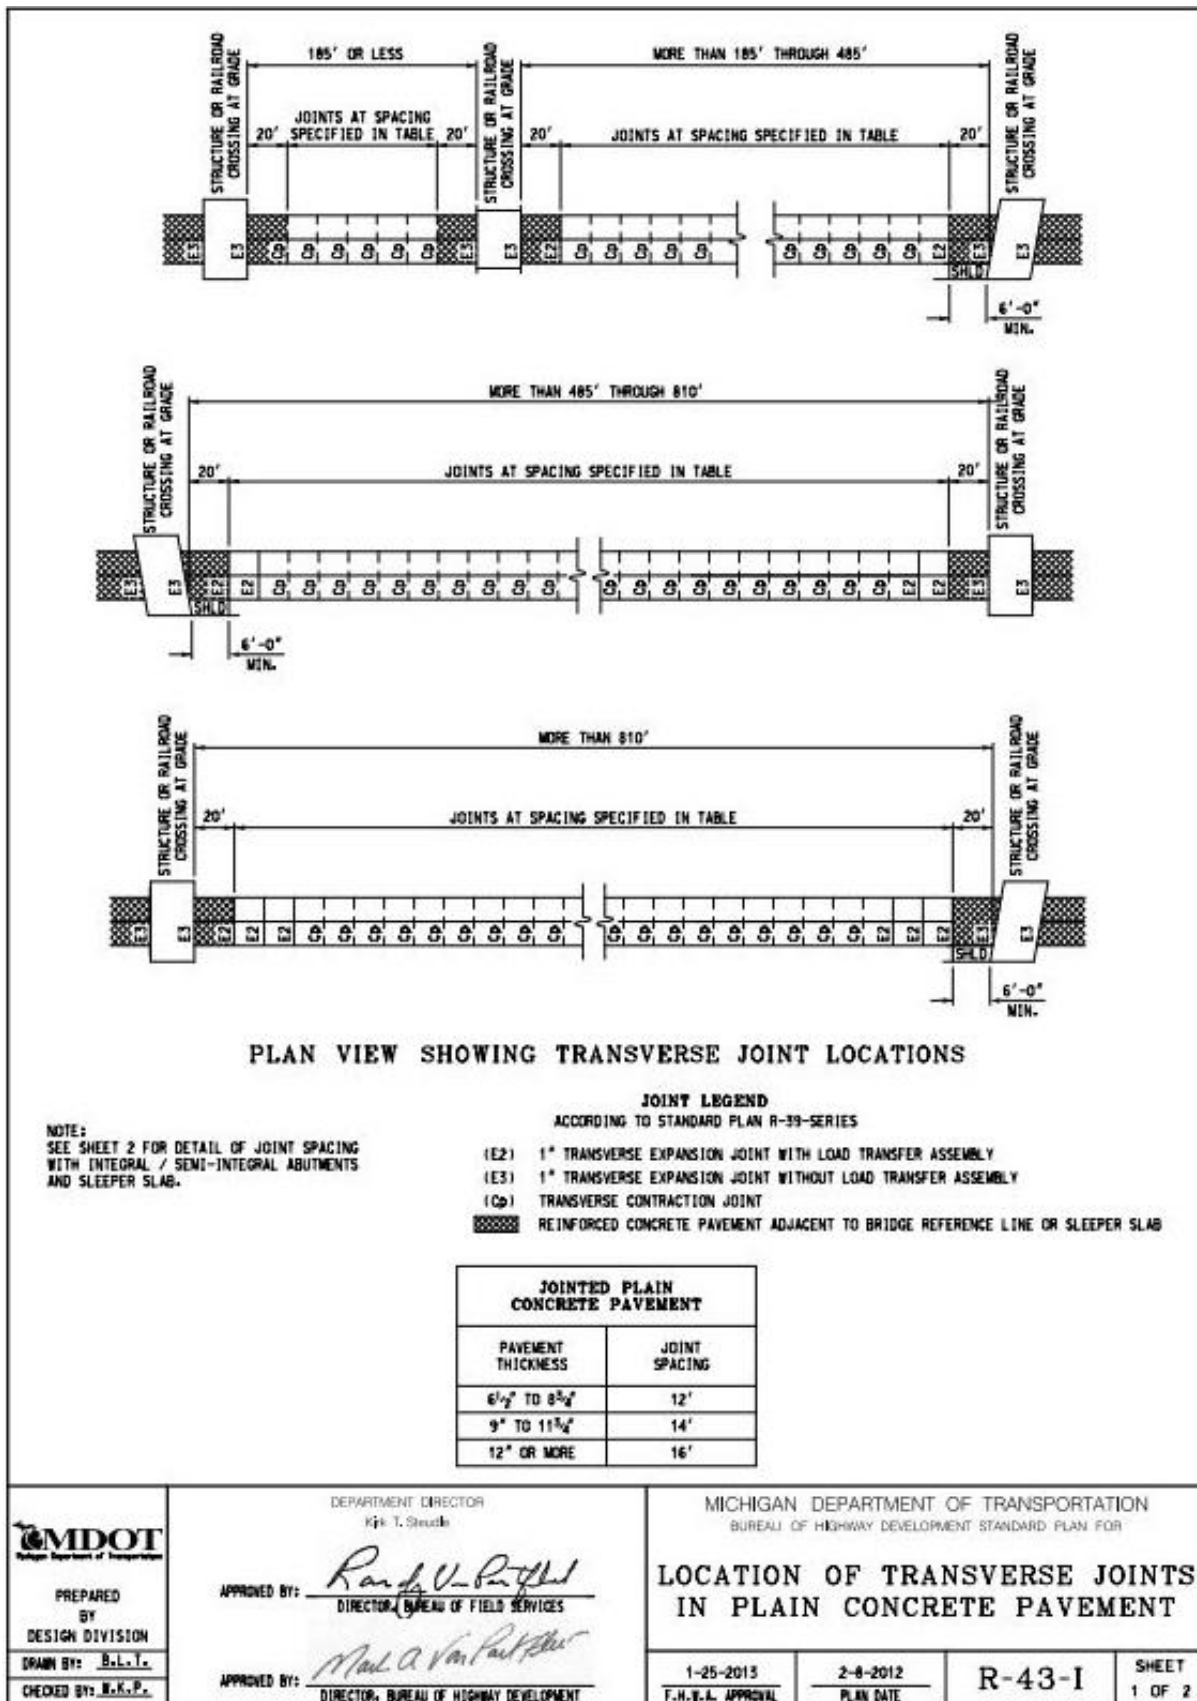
Michigan DOT pressure relief joint spacing standard drawing (from MDOT)
